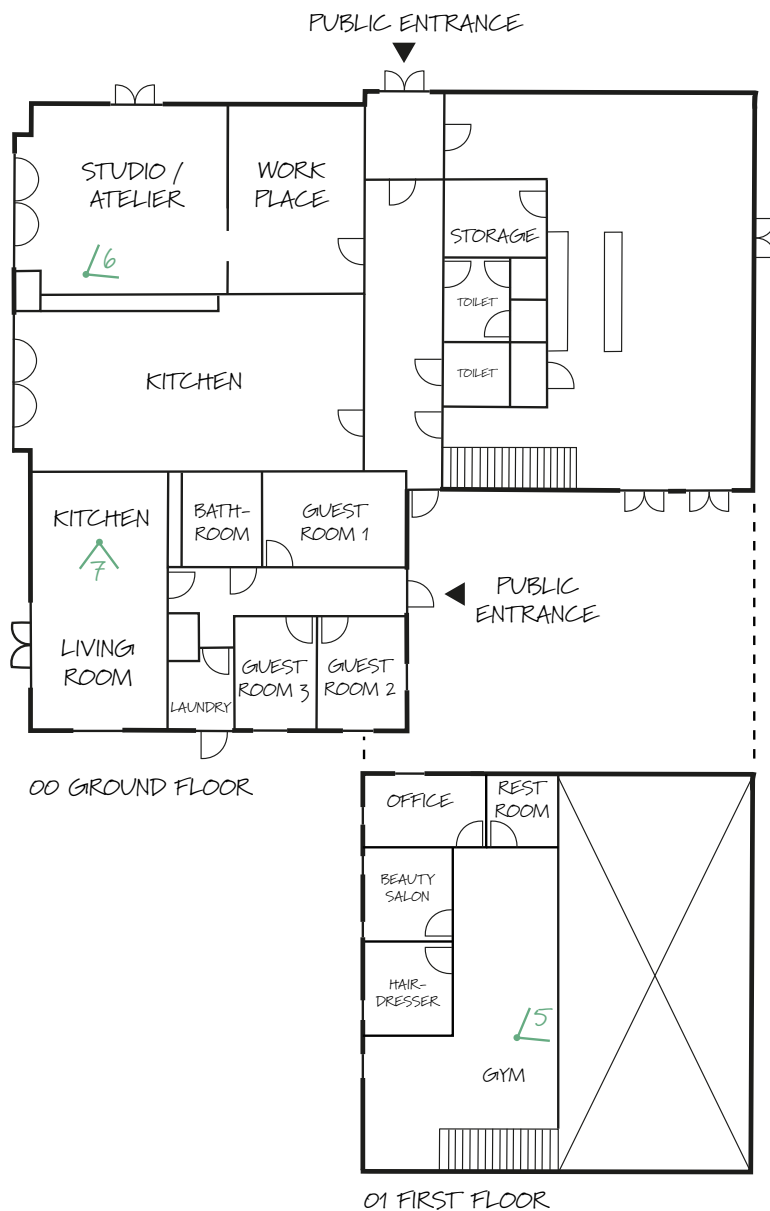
Visualisation of floor plan meeting place building, own sketch (2023).
